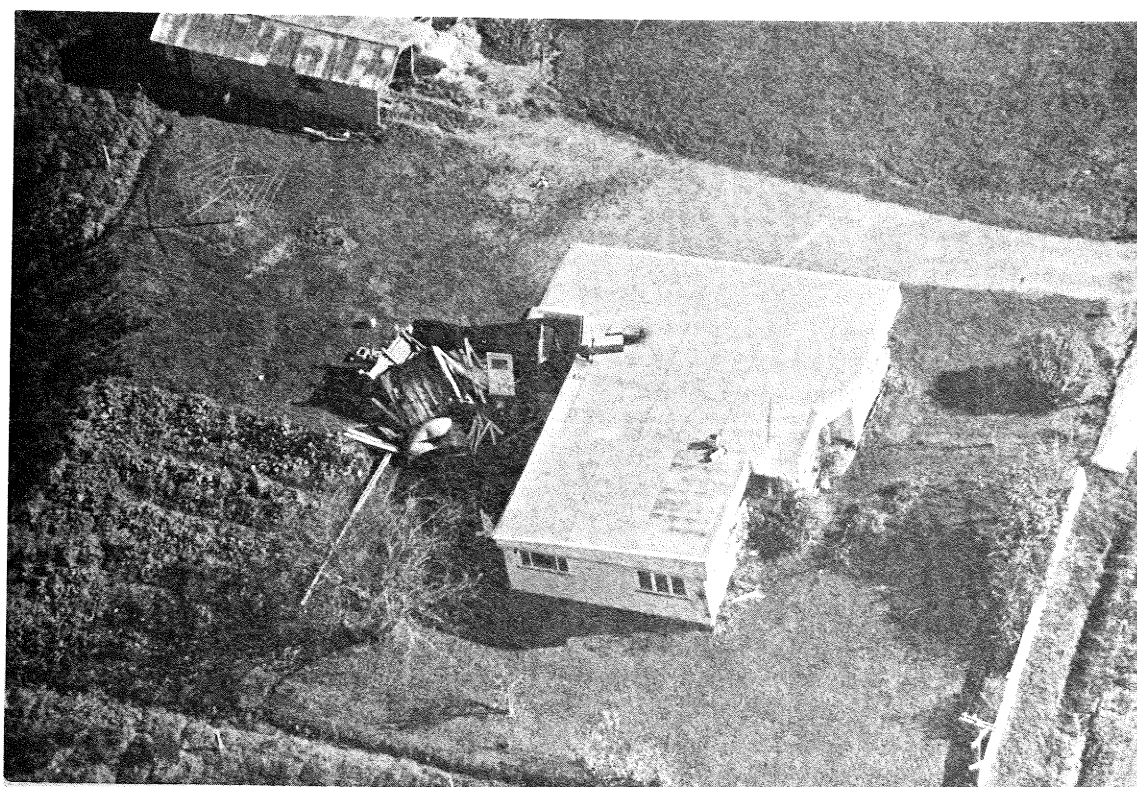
Aerial view of damaged dwelling, showing the collapsed chimneys and tank stand. photo B.H. Falconer
